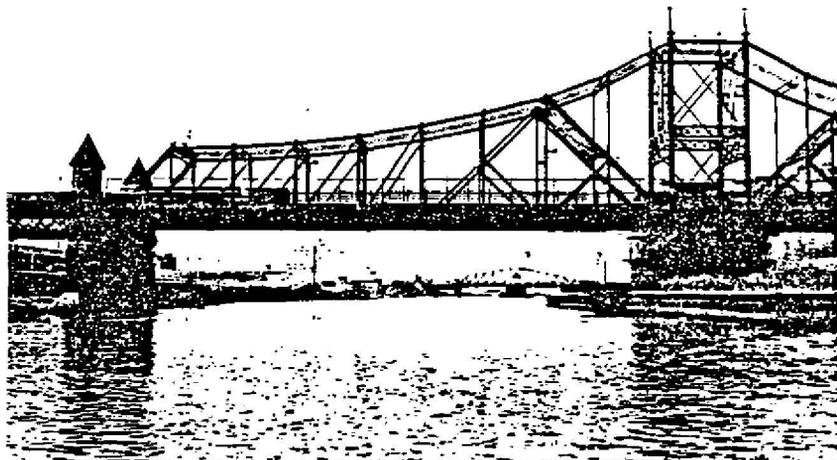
Macomb's Dam Bridge looking south; East 149th Street Bridge is visible down-river.
